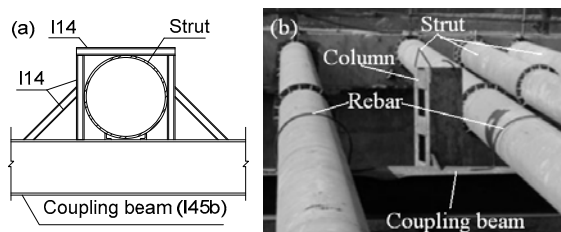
Designed connection (a) and actual connection (b) of pipe strut and coupling beam
